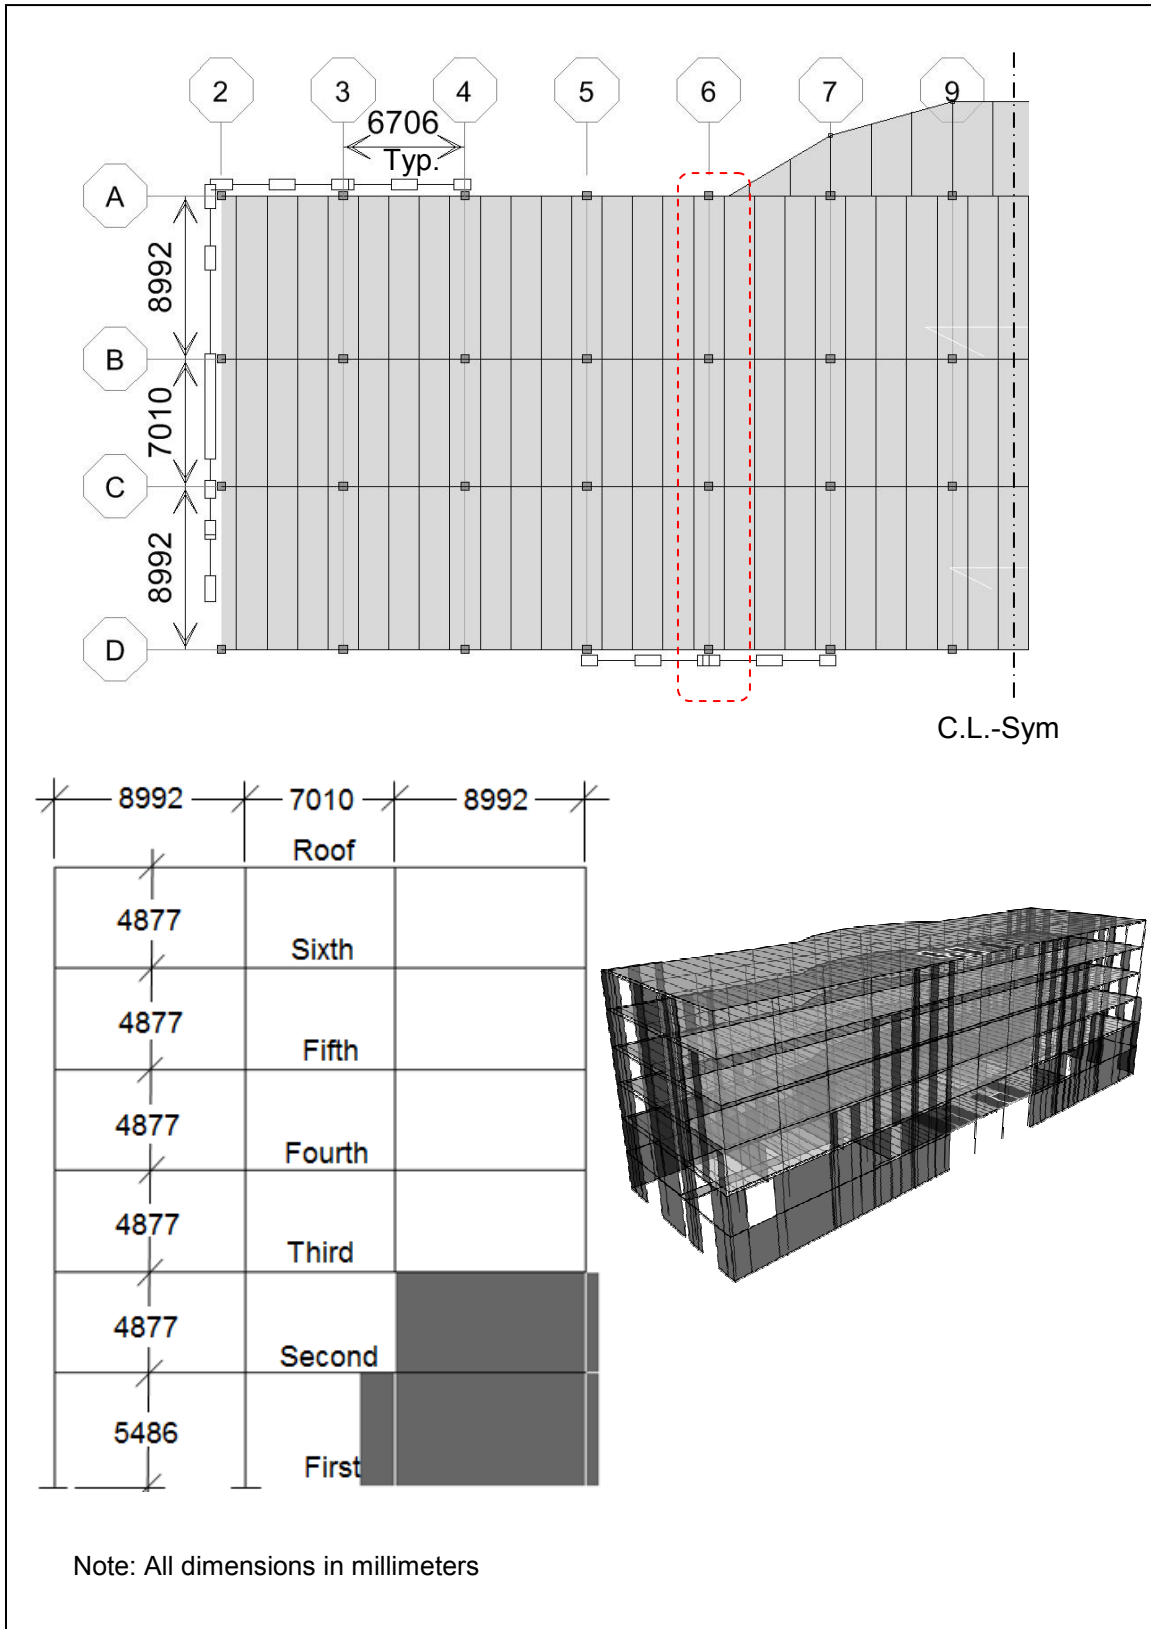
Building SW-2 3D, Plan and Section at Gridline 6
